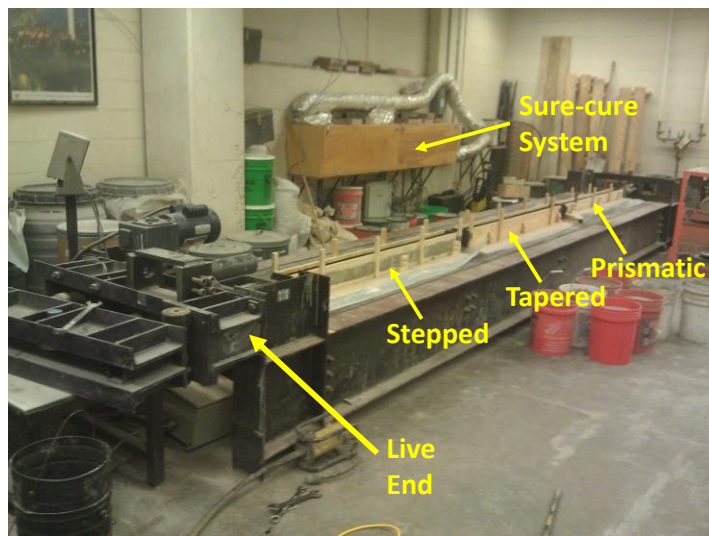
Photograph of Casting Bed Layout and Tensioning System
